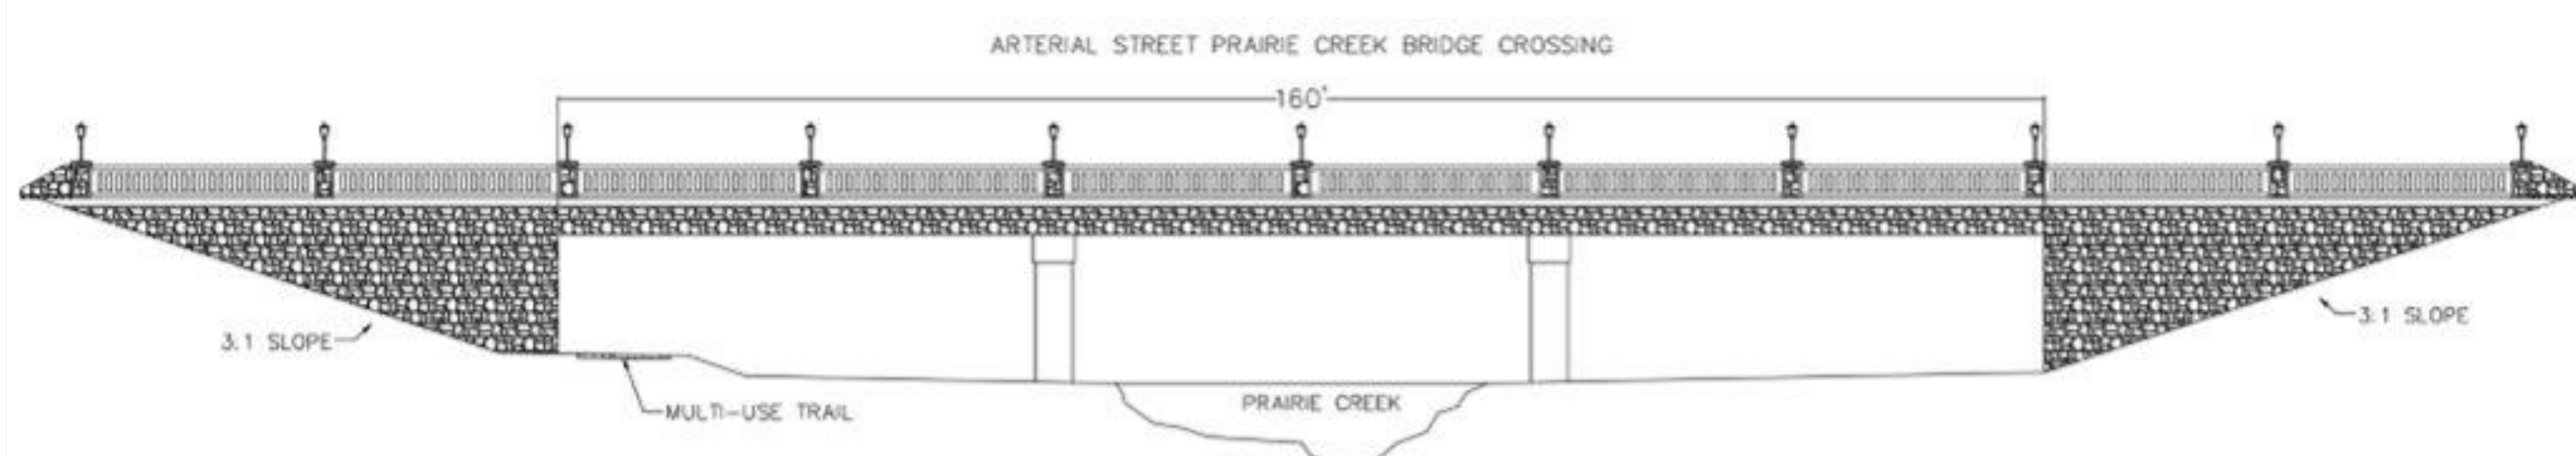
Proposed Prairie Creek bridge aesthetics and geometry.
